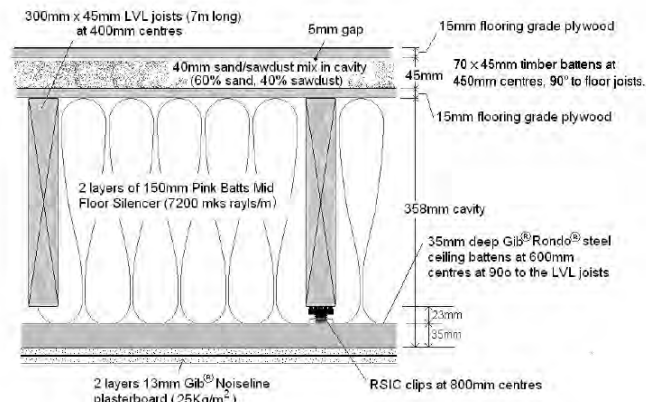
The ‘40mm Sand/Sawdust Floor’.
